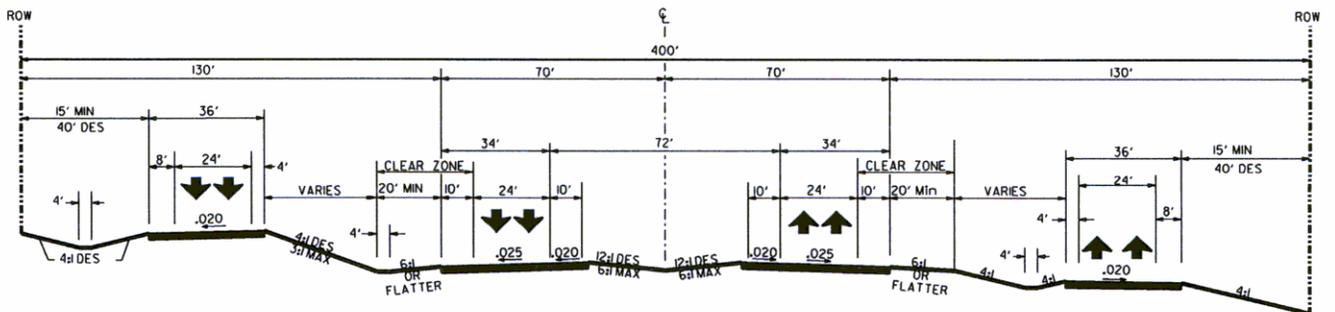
EXHIBIT B. PROPOSED TYPICAL SECTIONS
